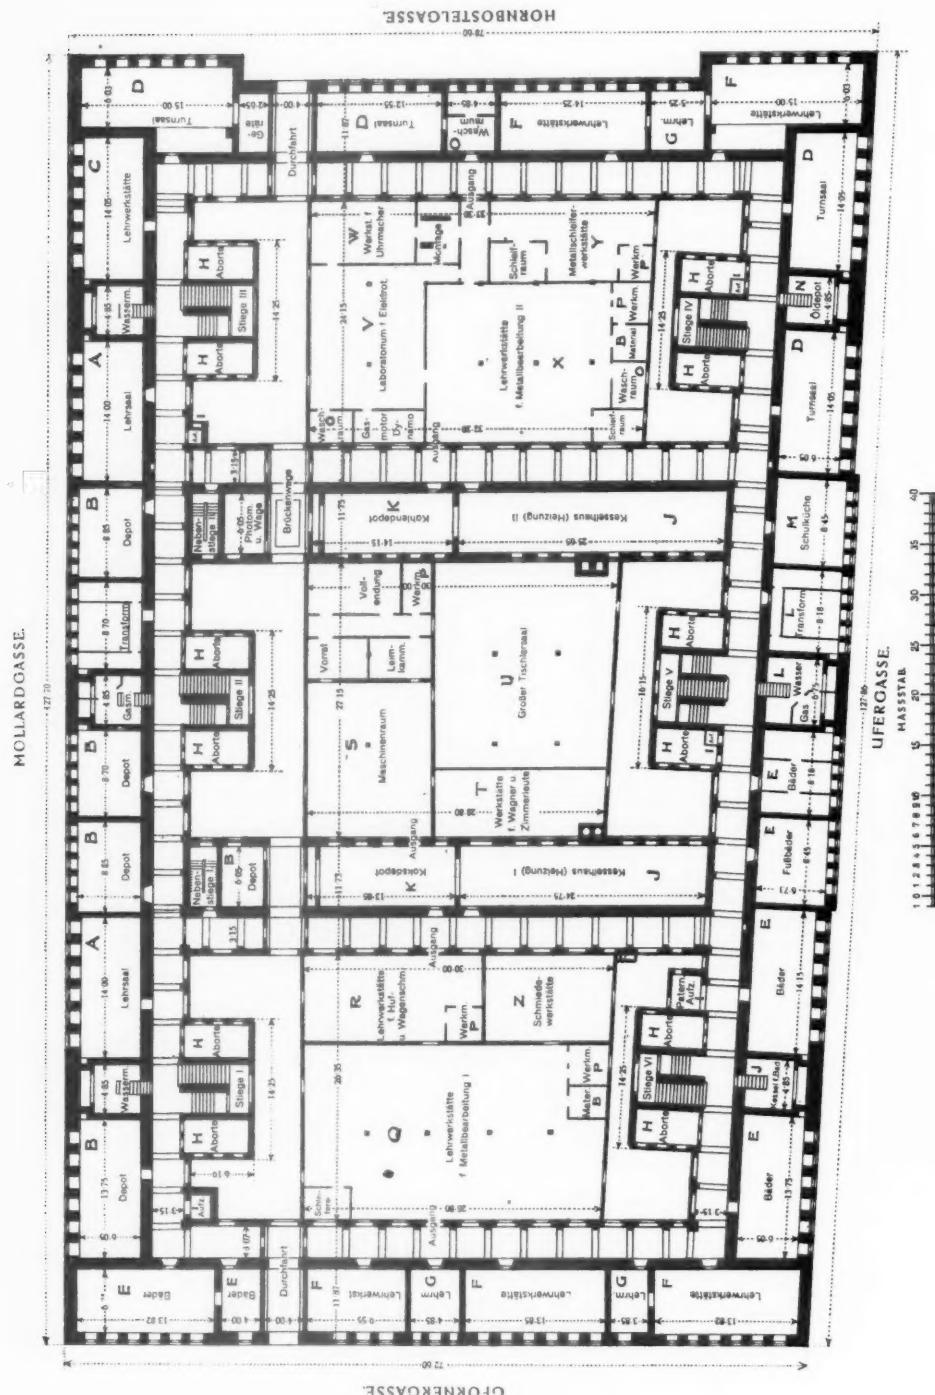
CENTRAL TRADE CONTINUATION SCHOOL, VIENNA: BASEMENT PLAN.
